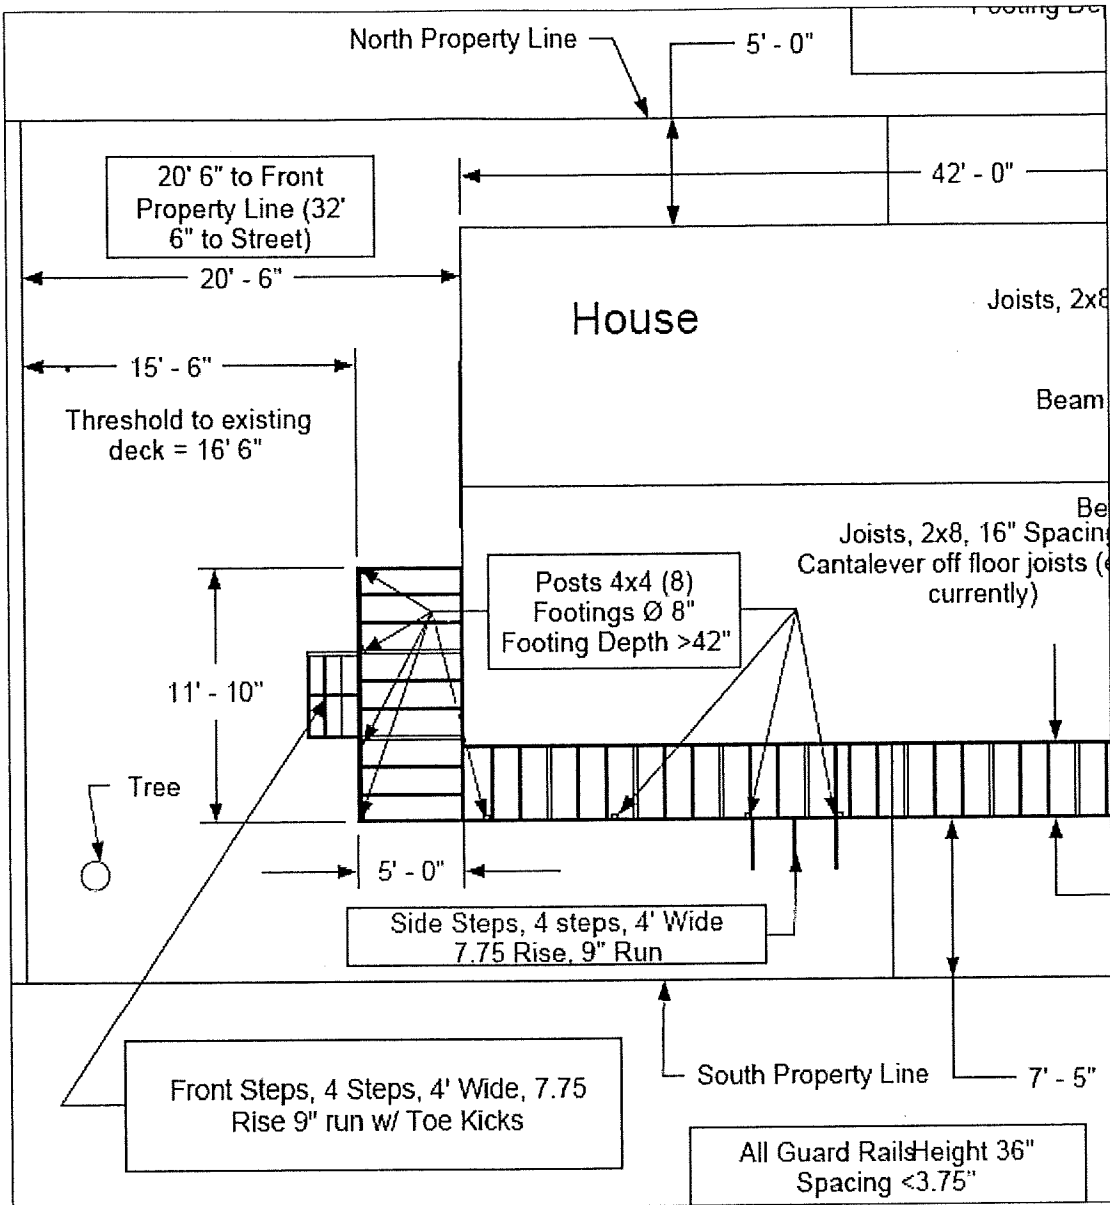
This is a drawing showing the building plans for the front deck portion of the house. Not shown, the outer beam is two 2x10's and the joists are 2x8.
